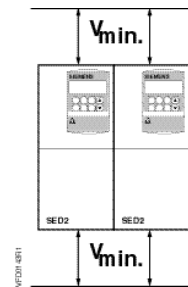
IP20 SED2 Mounting Dimensions in Inches (Millimeters).
